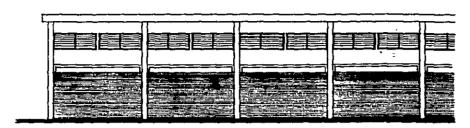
Custom Built Factory Type II, Sectional Detail
